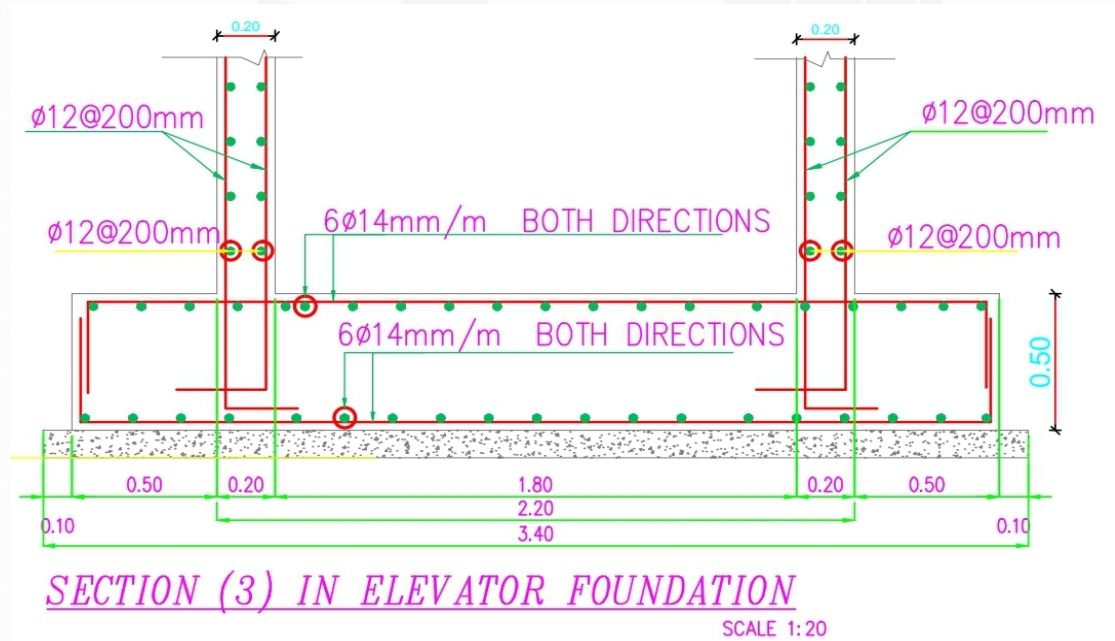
Reinforcement detailing for Elevator Foundation
